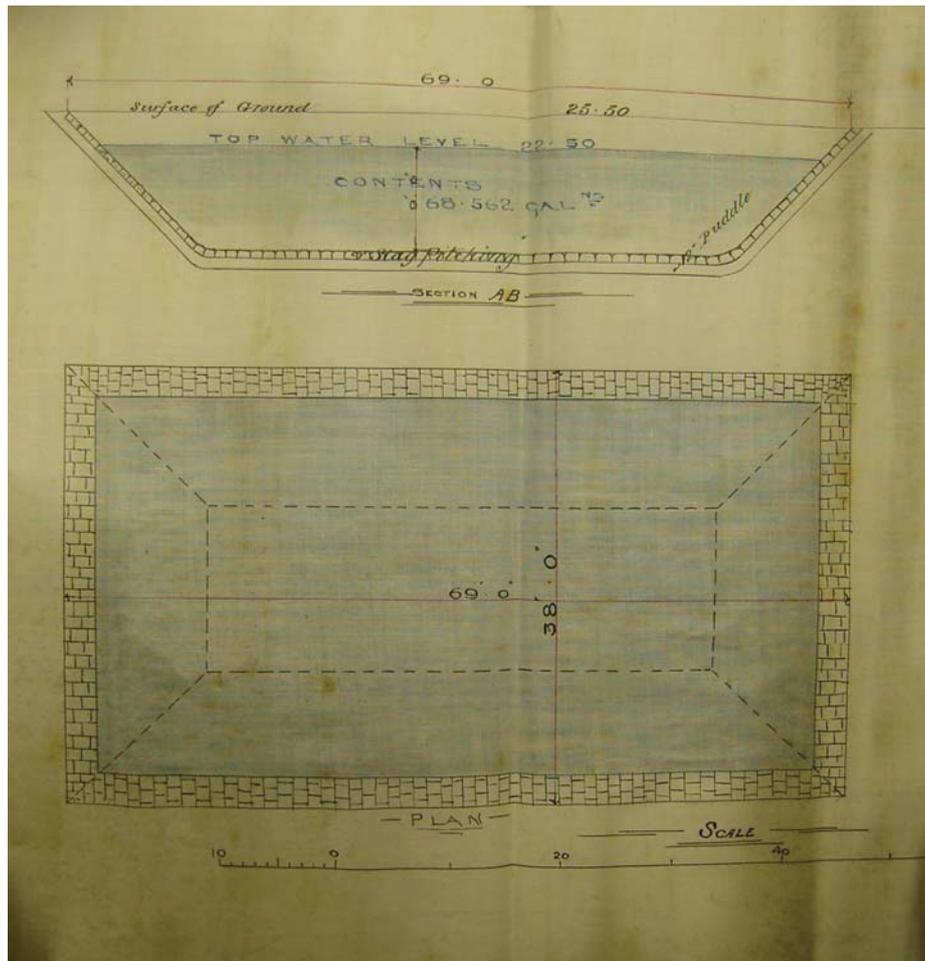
Undated cross-section through the proposed water tank for the steam corn mill (Site 09) (after CRO(B) Z3198 n.d.)
